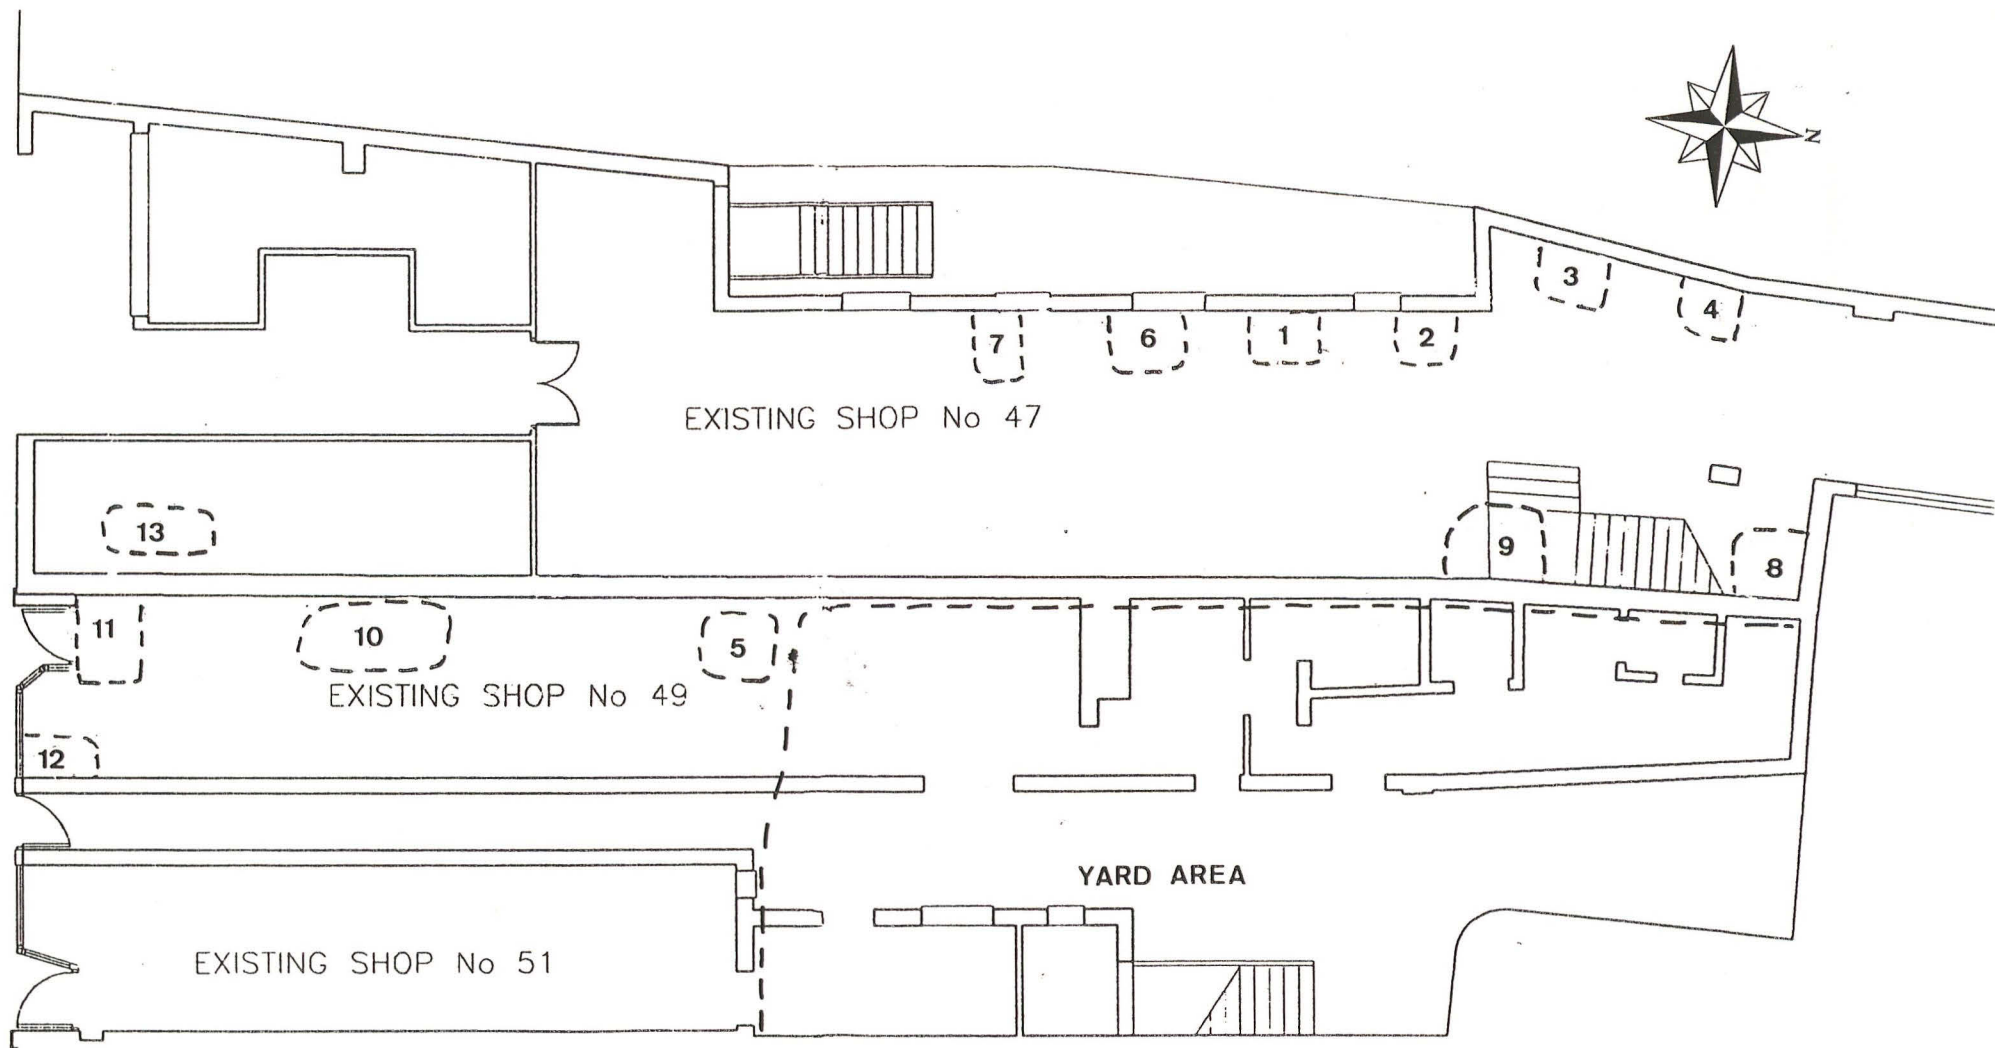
Site plan showing the location of the yard area and foundation pits 1-13 (1:125).
